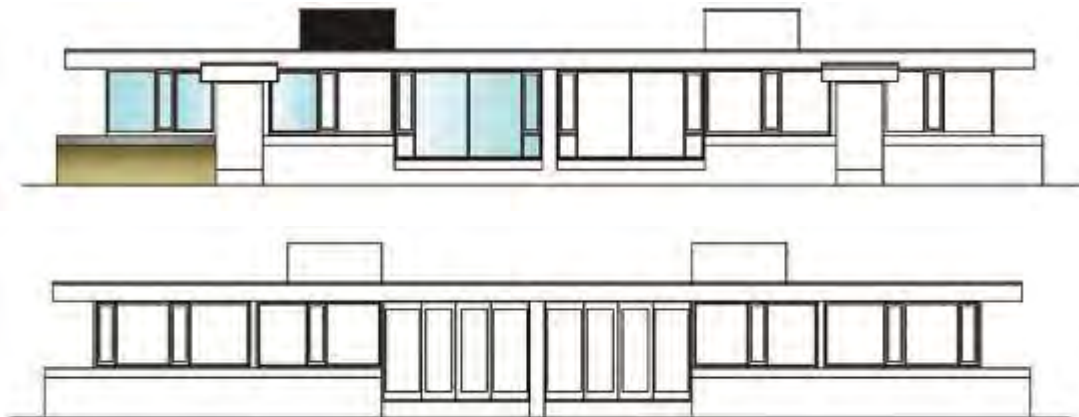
Elevations of Nos 4-5 Airthrey Castle Yard (rear, or entrance elevation top, front, or garden elevation bottom). The principal elevations of Nos 6-7 are very similar. *UoSA
